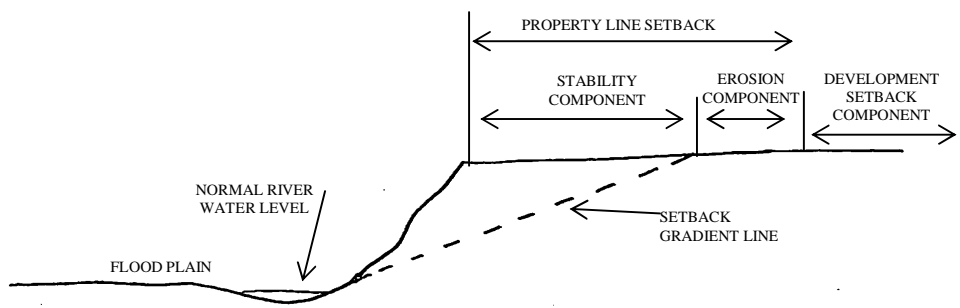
OVERSTEEPENED VALLEY WALL SLOPE SUBJECT TO TOE EROSION
